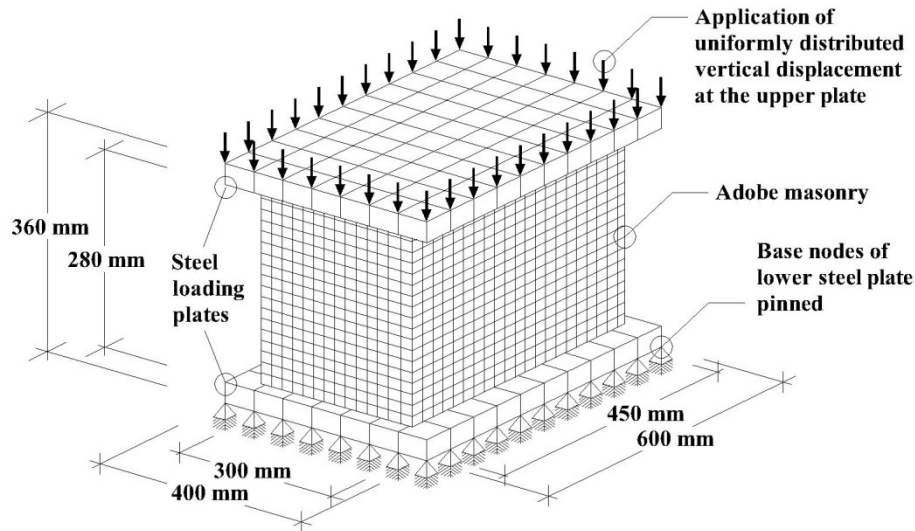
Finite element model used for the analysis of adobe masonry assemblage subjected to compressive loading and unloading.
